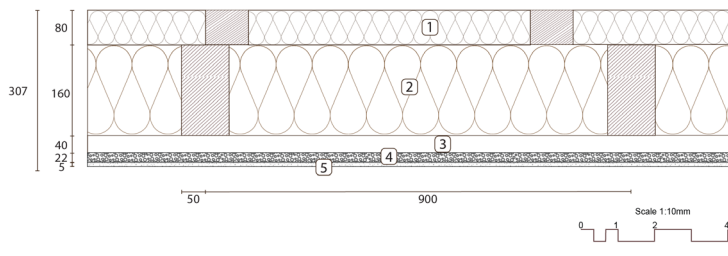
Cold roof callout - Scale 1:10 (Author's drawing)
